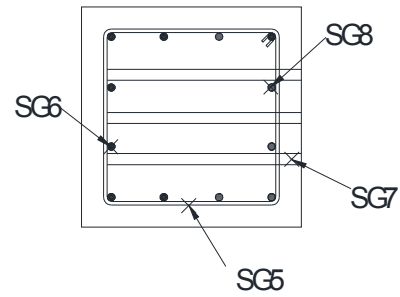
Strain Gauges Locations for Precast Beam-Column Specimens
